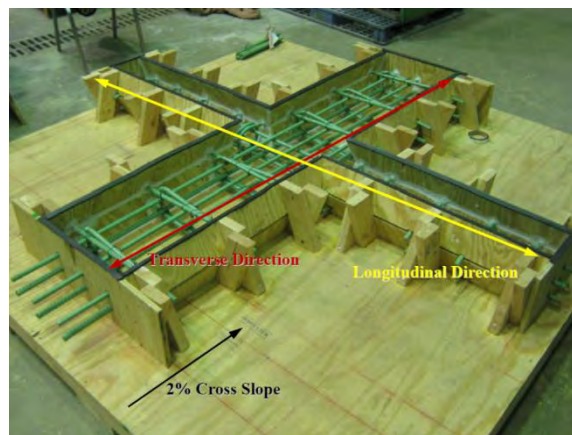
UHPC Joint Constructability Test Specimen (Hartwell, 2011)
